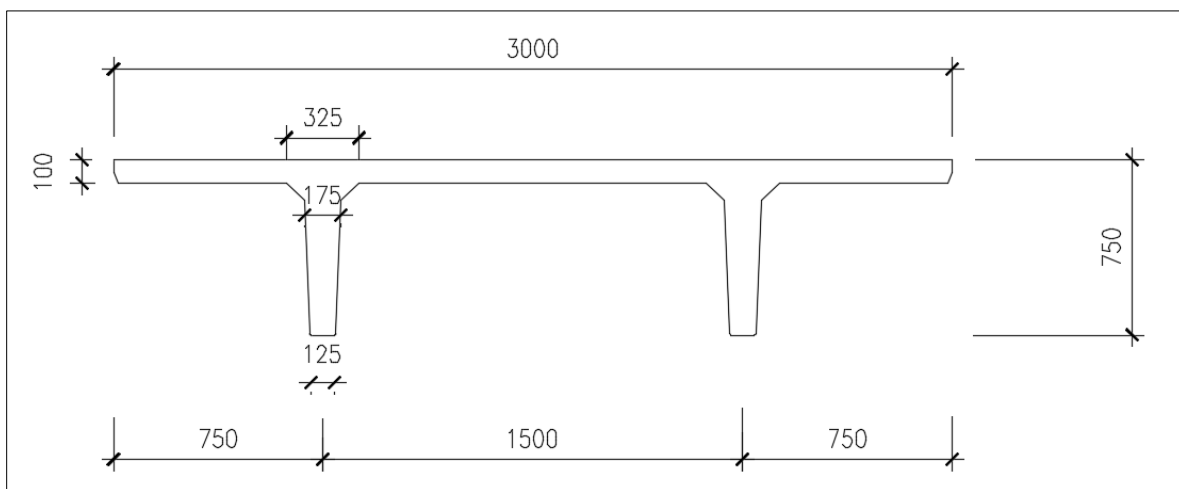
Proposed Sectional Geometry for Fully Precast Standard DT for Floor Members of Parking Structures for Indian Markets (all dimensions in mm)
